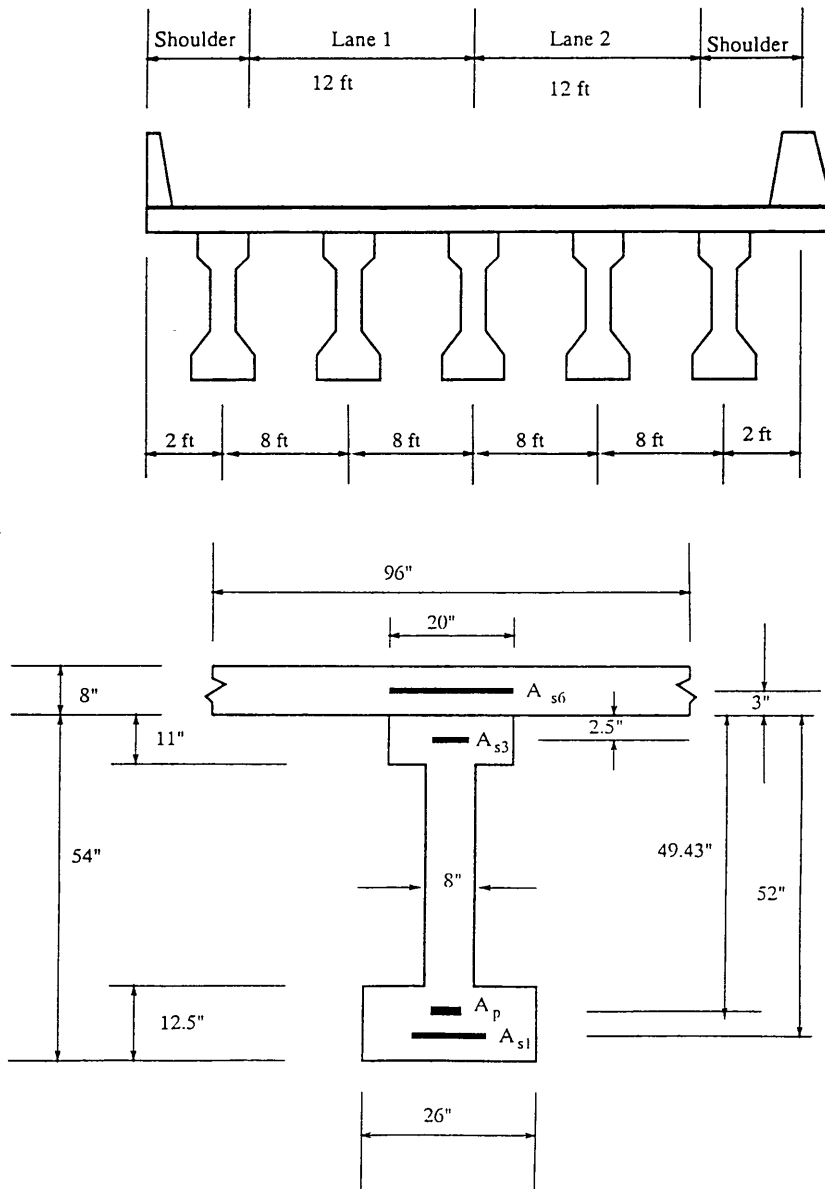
Cross section of a typical slab-and-girder bridge.
